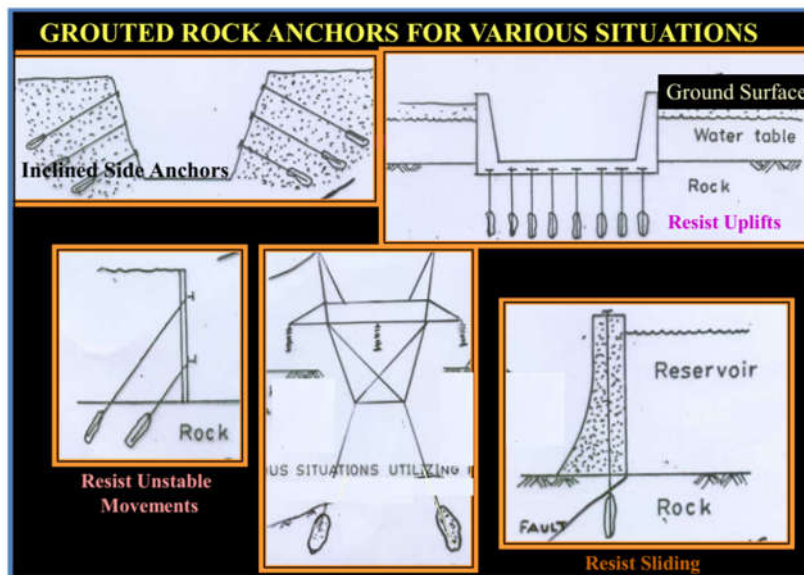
Grouting Applications for Foundation subjected to Tension
